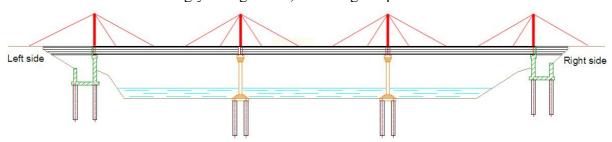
Sketch of pylons and cables (fan system) to increase the load carrying capacity
